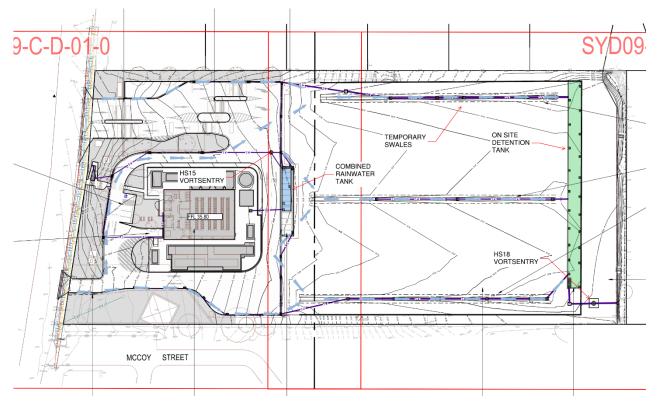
Stormwater Management Plan Approved under DA-21-01058
